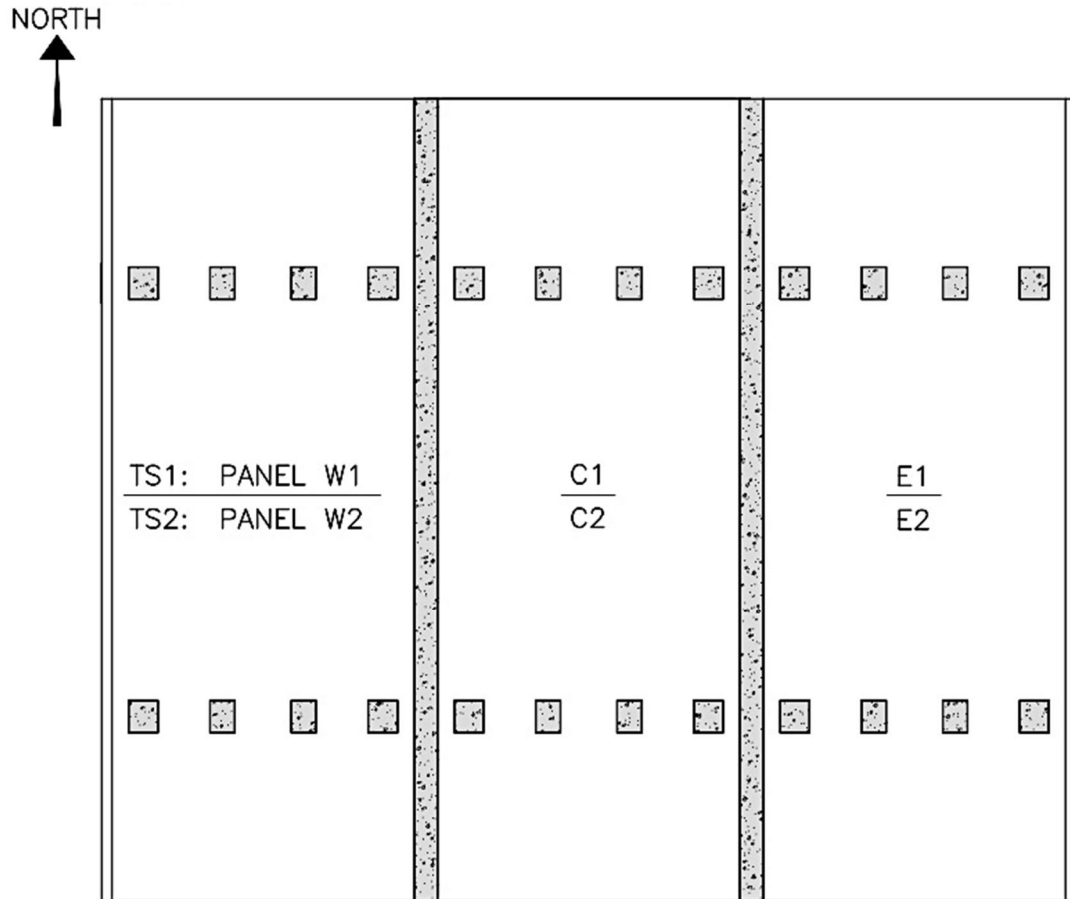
Naming Convention for Test Specimens (Plan View)
